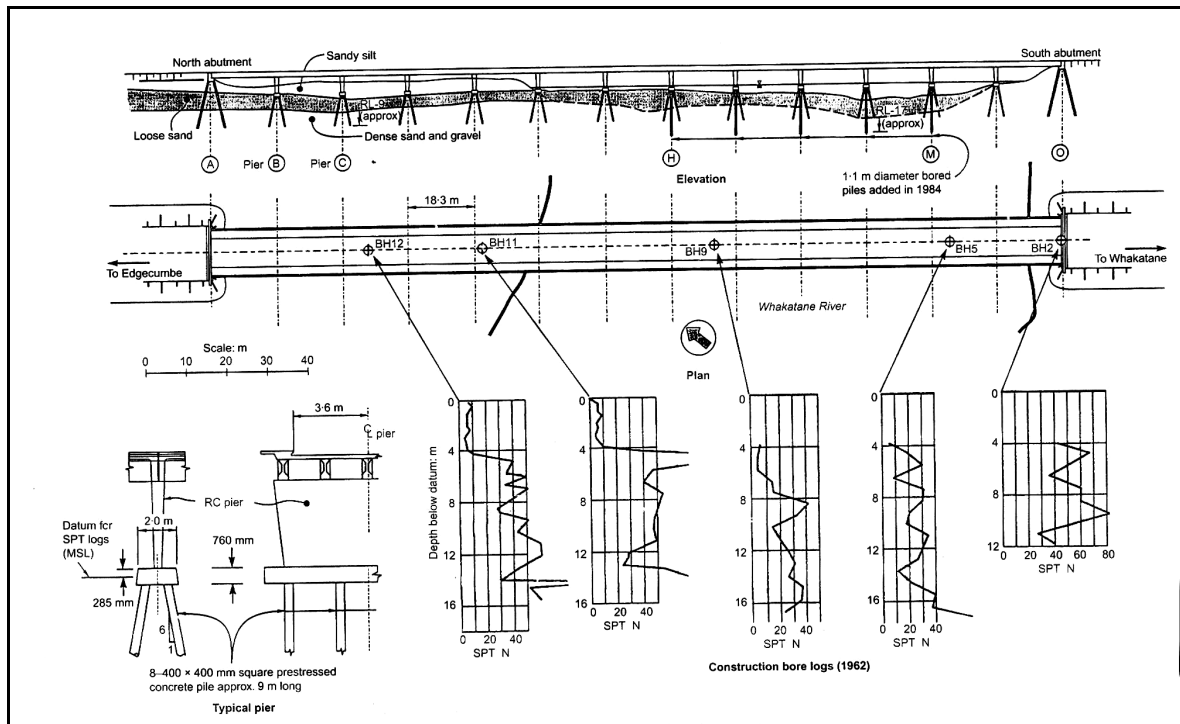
Plan and structural details of the Landing Road Bridge that sustained the 6.3 earthquake in spite of lateral spreading (after Berrill et al., 2001).
